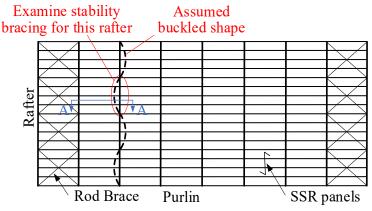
Plan view of typical metal building roof framing with assumed buckled shape of rafter
